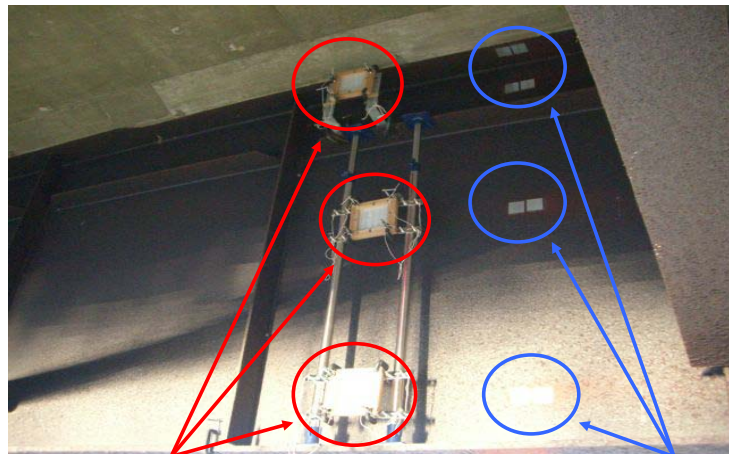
Continuous composite girder bridge designed based on LSD (montage)
